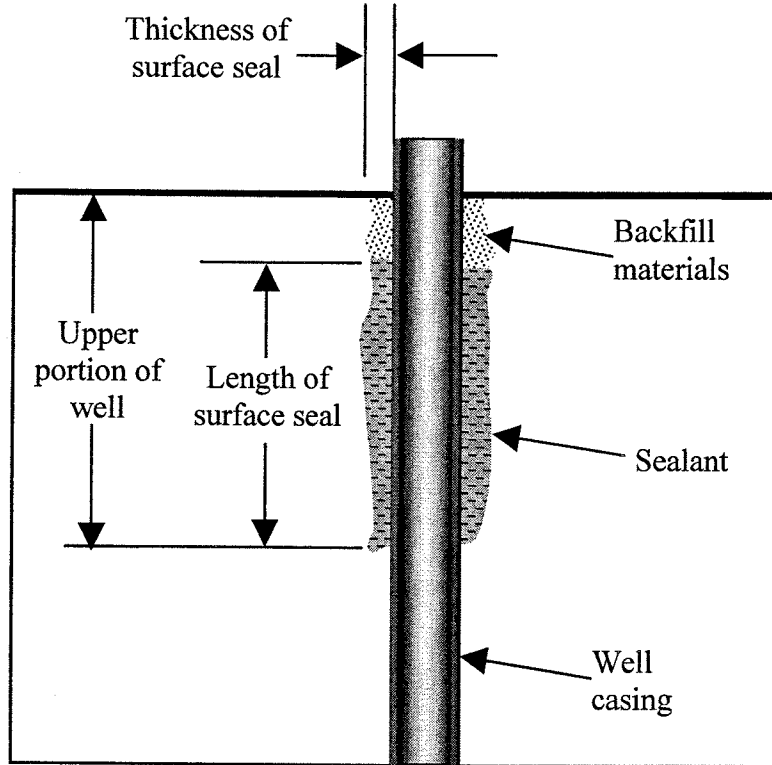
Surface seal in the outermost annulus of the well (surface casing removed).
